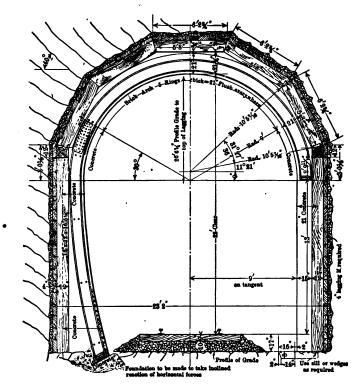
Concrete Tunnel Lining with Steel Rib Reinforcement, C. C. & O. Ry.
